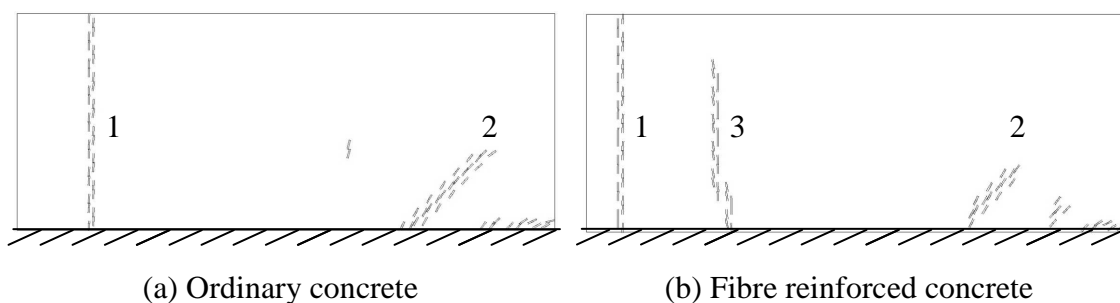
Crack pattern of 100 % open cracks for edge beam with cross-section 0, with or without fibre reinforcement.
